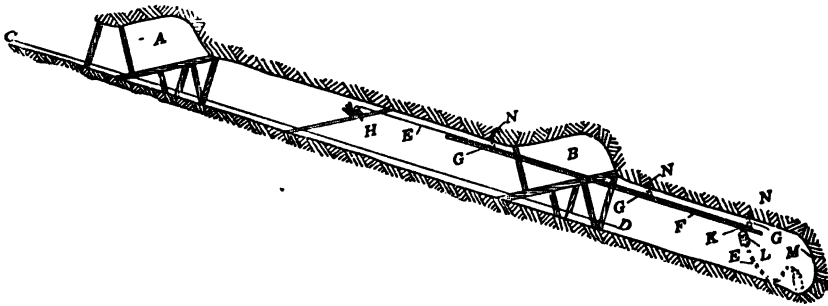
BUCKET TROLLEY FOR SHAFT SINKING.
